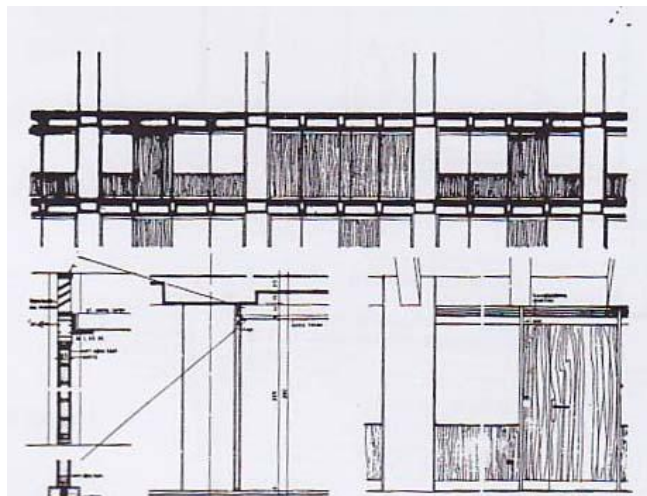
Bank and office building complex, section, details and modular solutions. (Mimar, Çađdaş Mimarlık, 1981).
